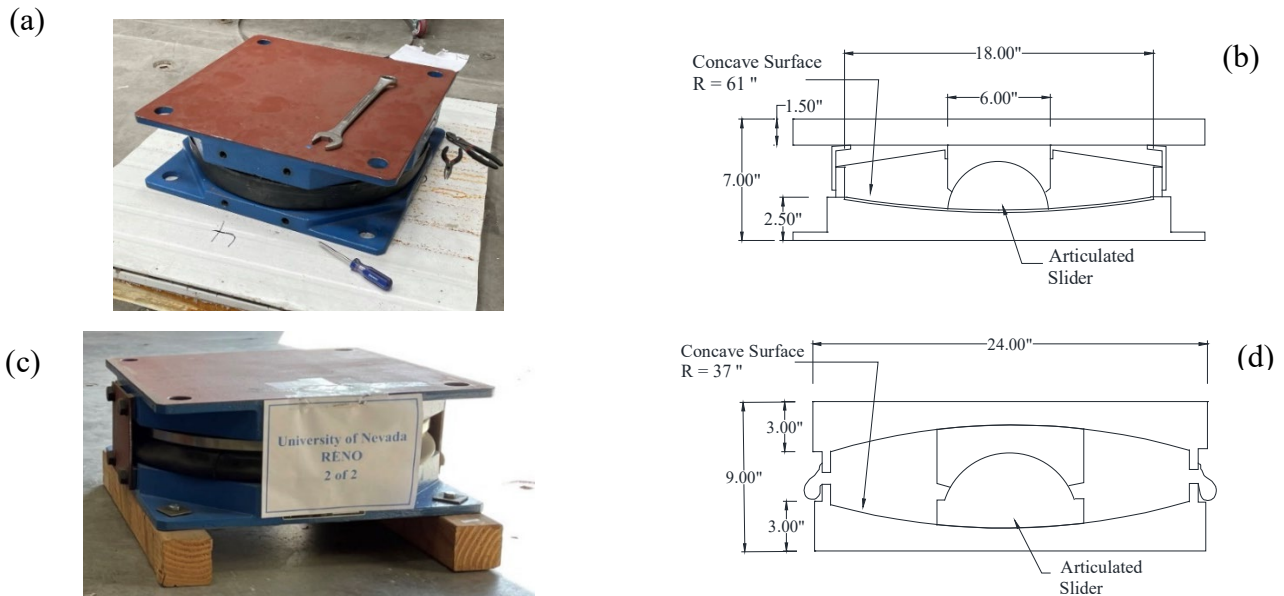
SPB (a) Photo (b) Cross section, and DPB (c) Photo (d) Cross section.
